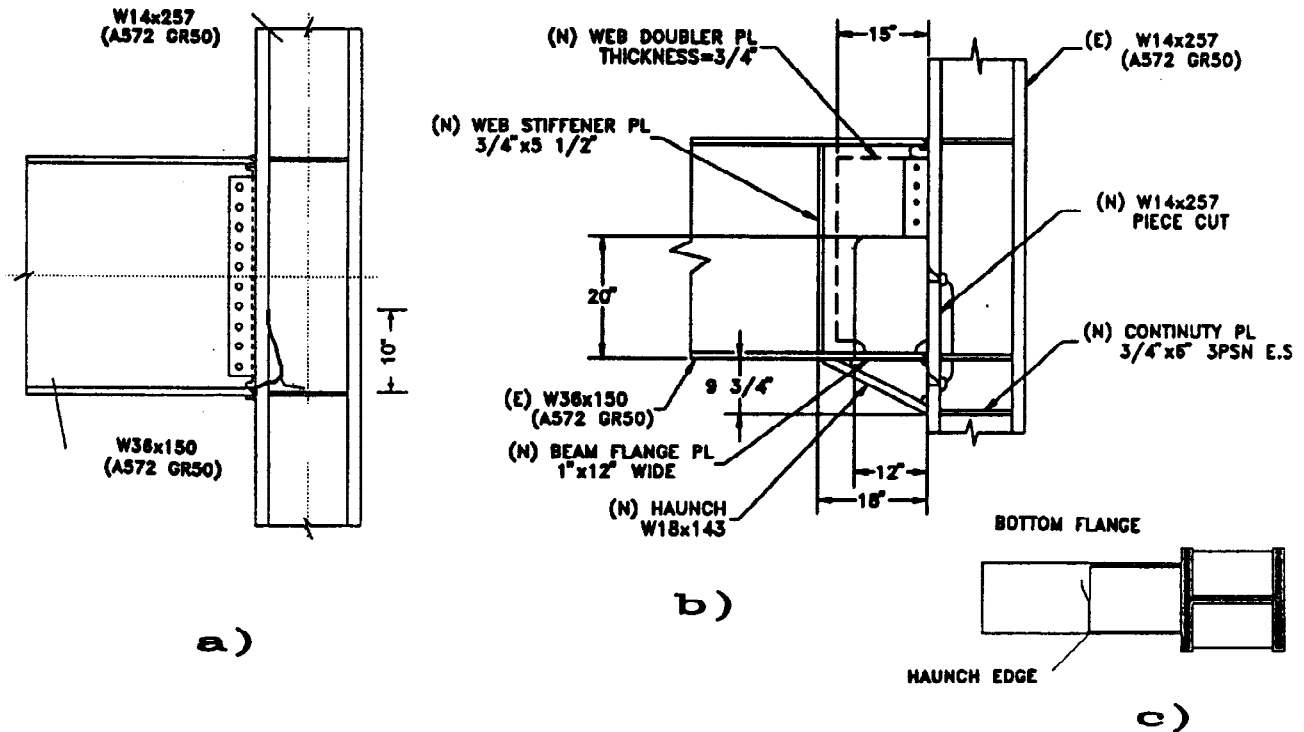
Specimen 2 -- Damage, repair, and damage of repaired connection
